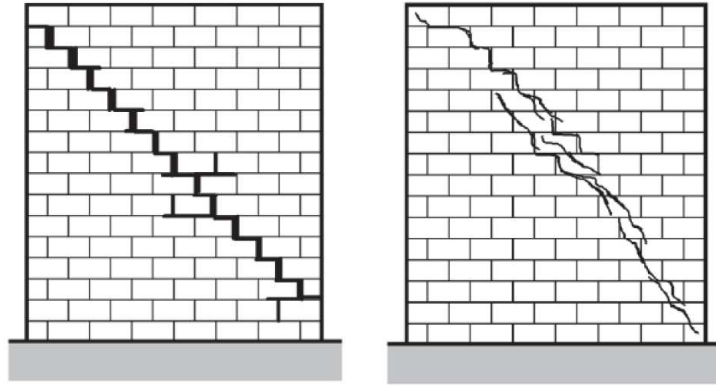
Left, stair-stepped cracking. Right, isotropic diagonal cracking.
